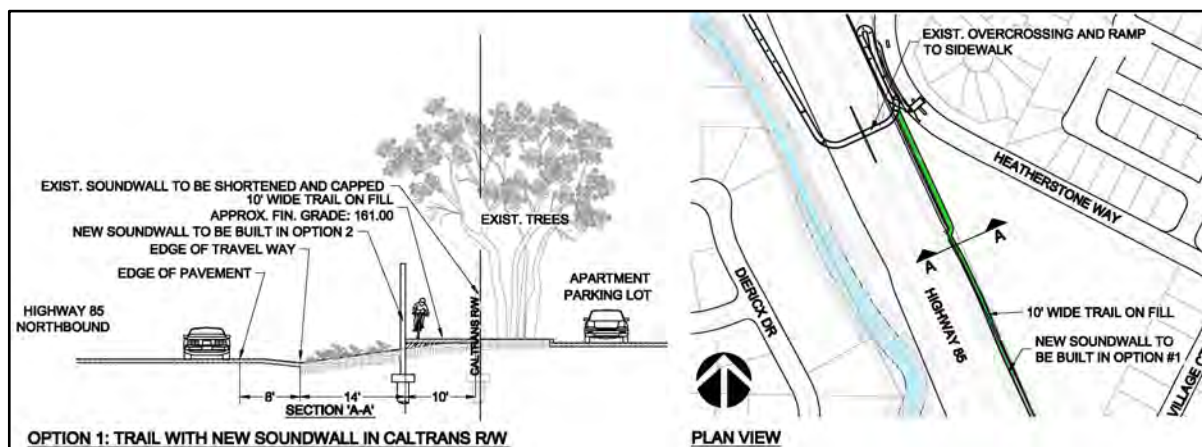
Trail behind Heatherstone Apartment with reconstructed soundwall.
